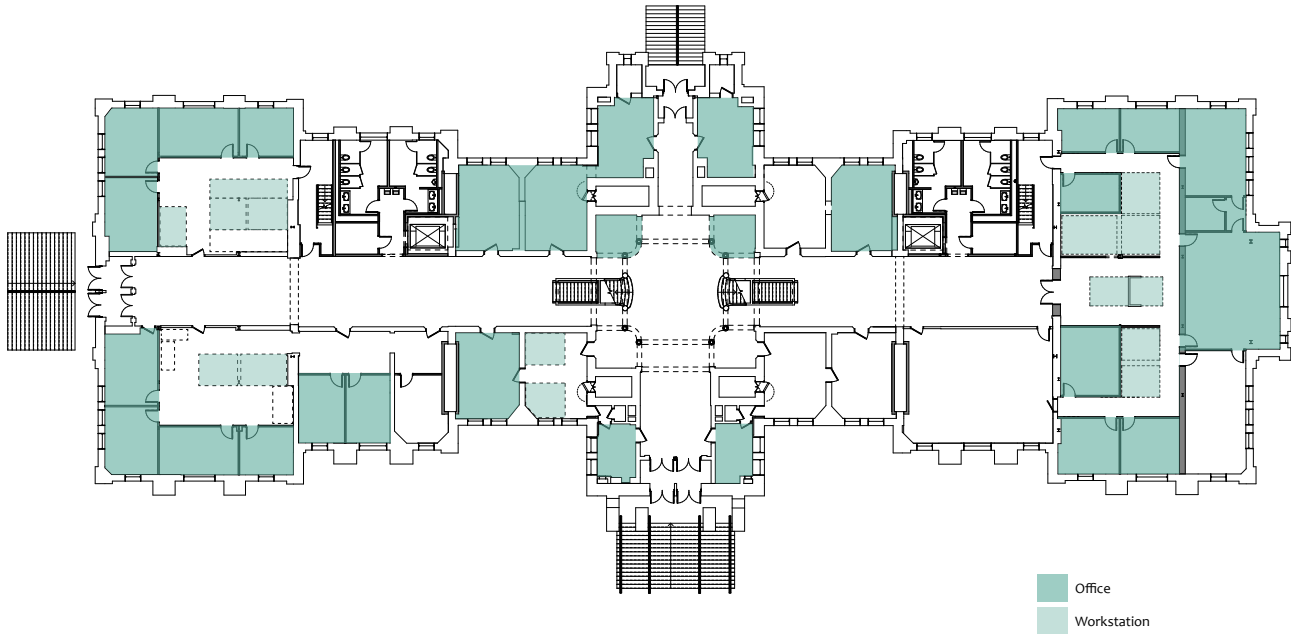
Proposed Office and Workstations - First Floor [Capitol]
